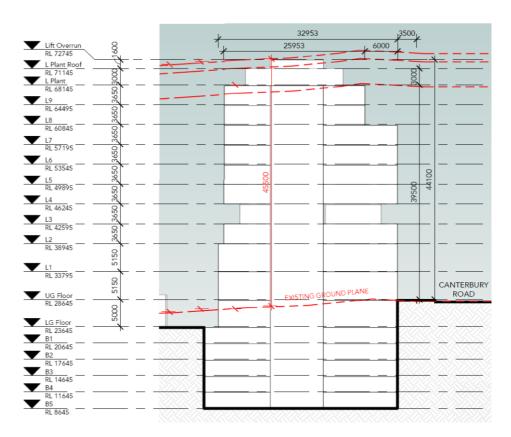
Indicative concept hospital building envelope (Source: Extract from the Planning Proposal, p.10)
